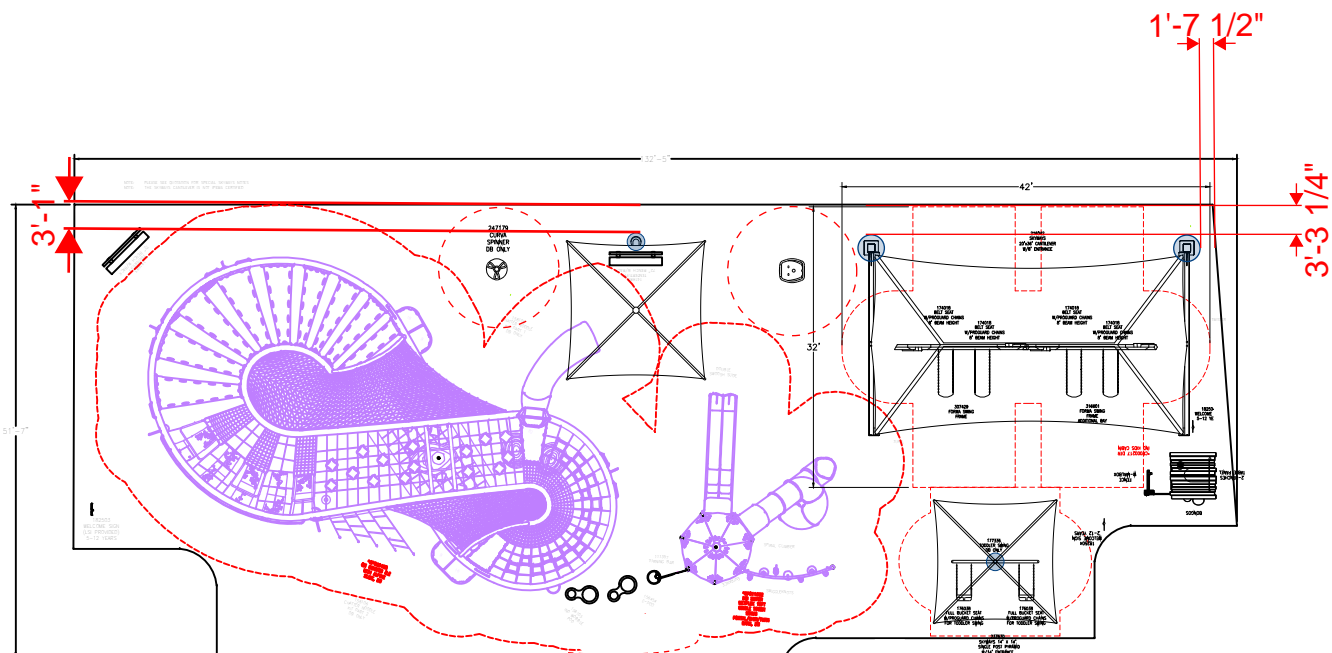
Exhibit A: The Mine at City Park Playground Design and Site Plan
